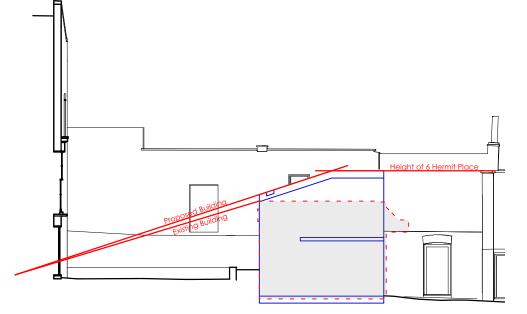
Diagram comparing the existing garage and the proposed roof profile
